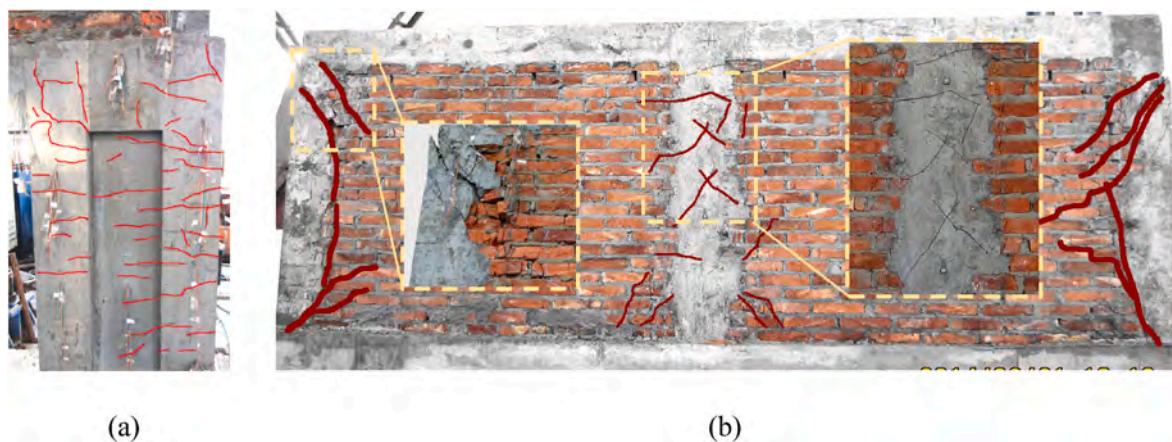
Failure modes of specimen W2: (a) Horizontal cracks of RC shear walls; (b) Primary cracks of W2 and crushing of masonry unit.
